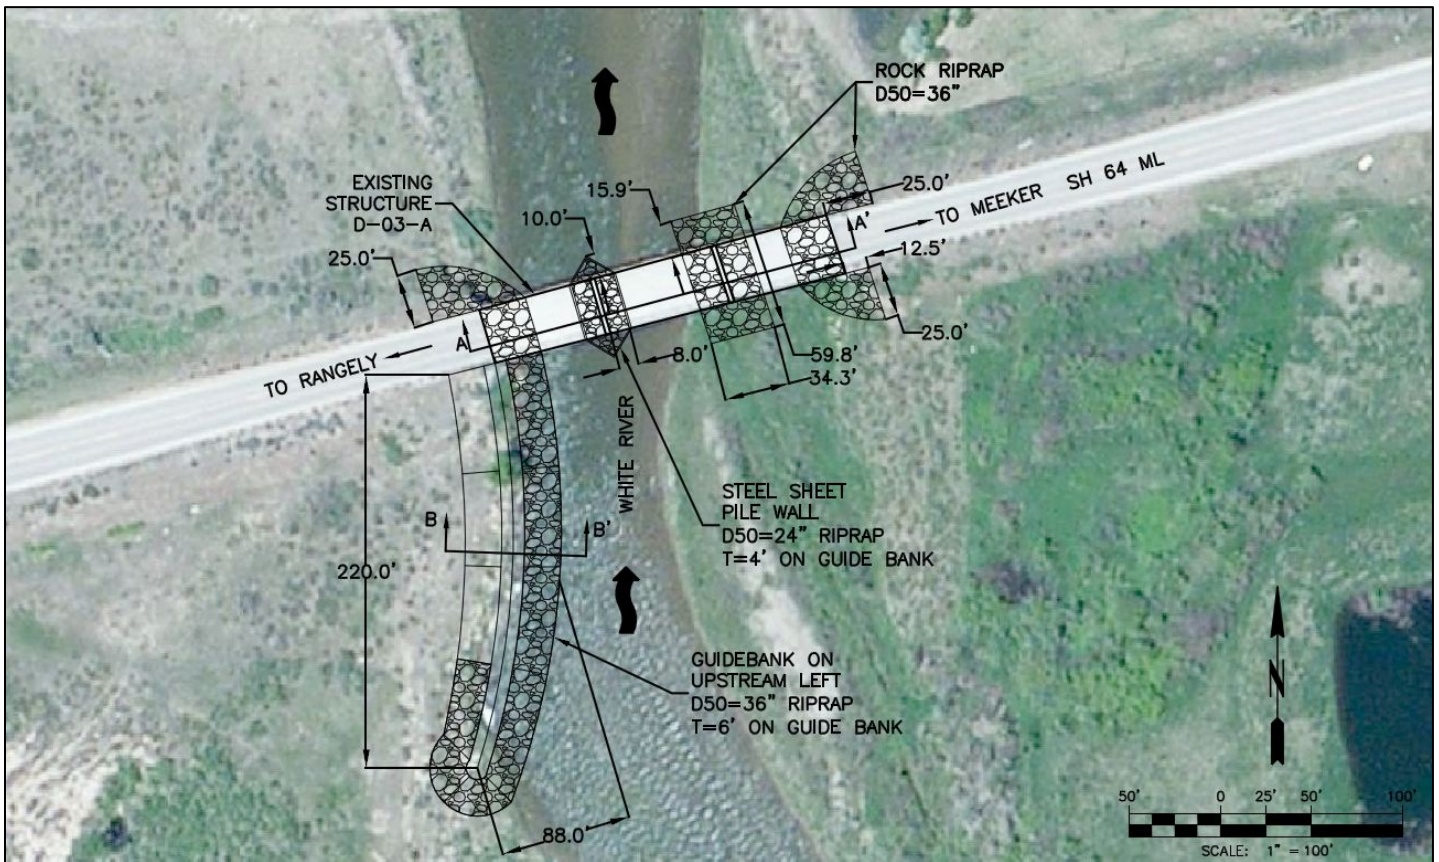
Plan view of Bridge D-03-A with designed hydraulic scour countermeasure locations
